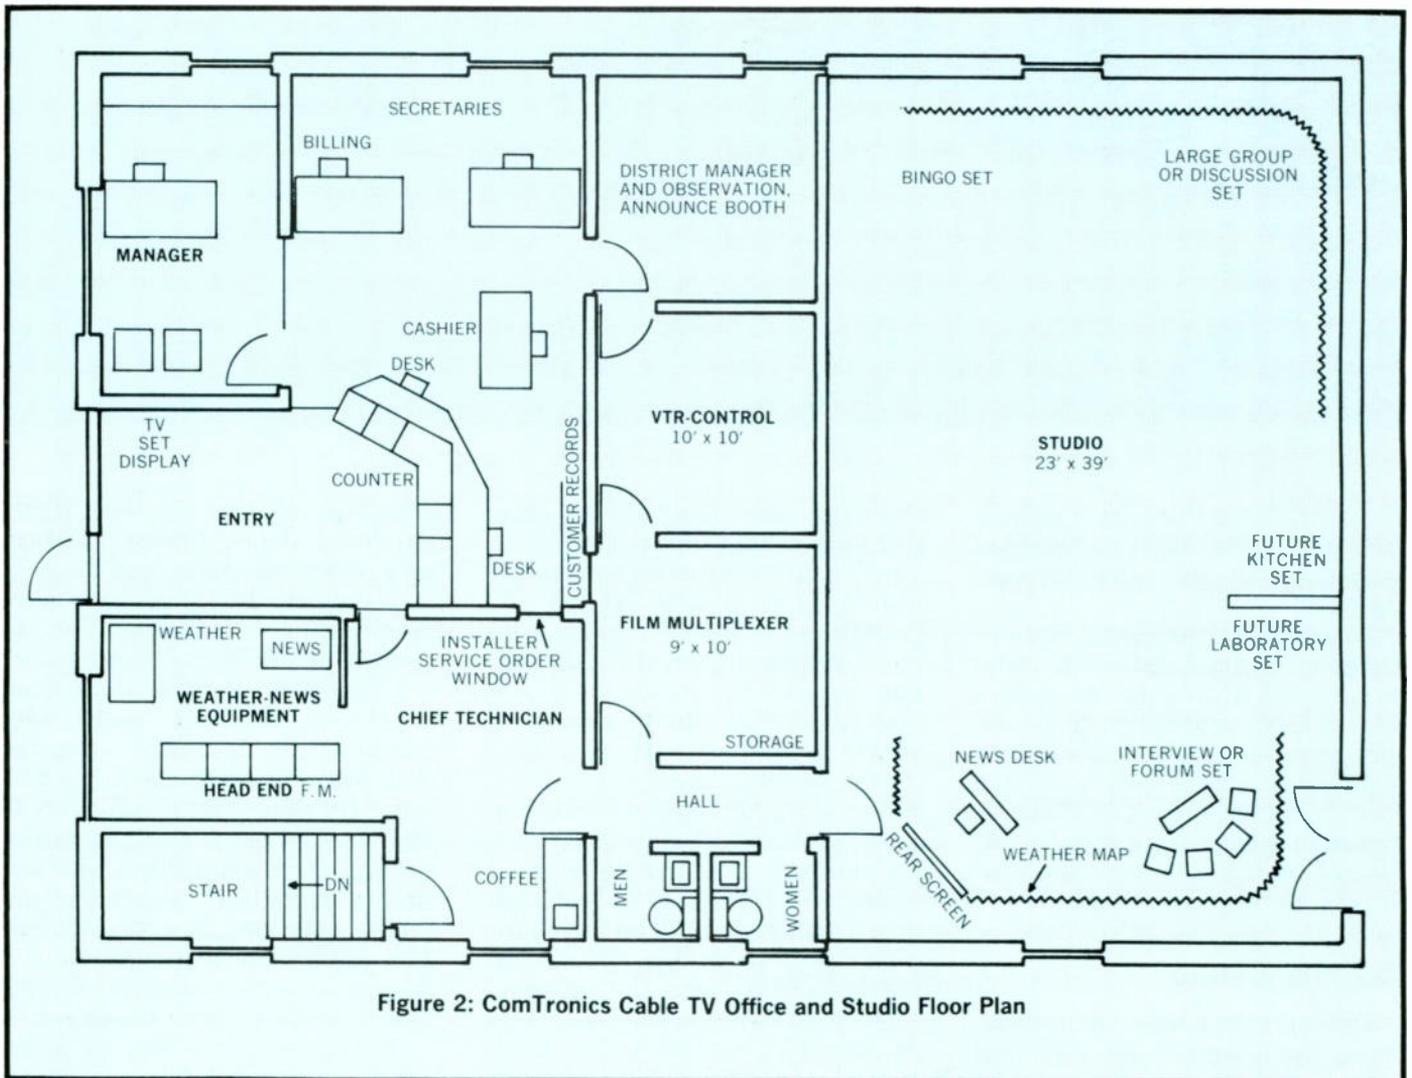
ComTronics Cable TV Office and Studio Floor Plan
